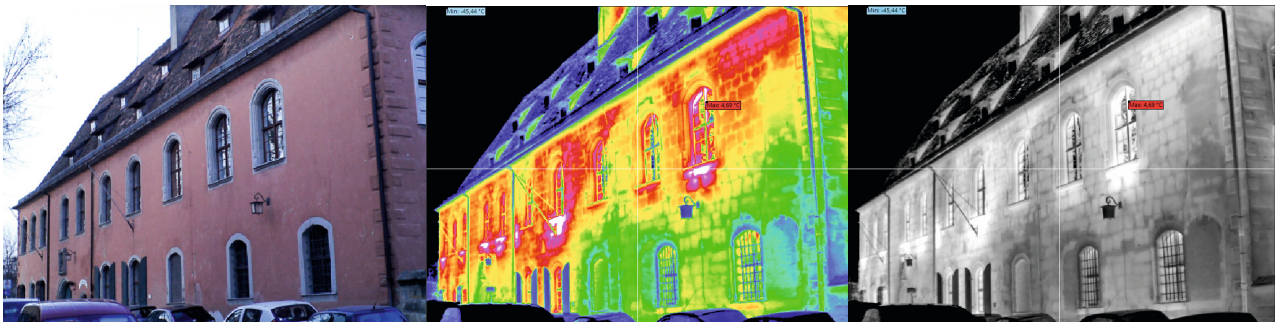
Thermogram of a plastered outer wall; masonry structure, added openings and construction joints become visible without interfering with the substance underneath the plaster [Luib 2018].
